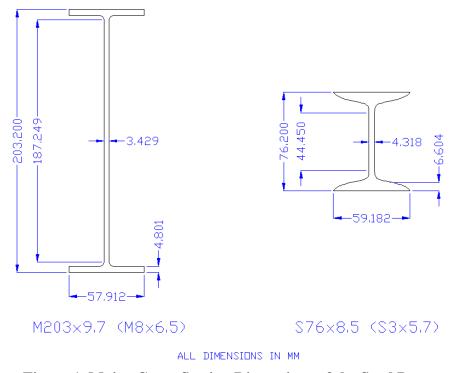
Major Cross-Section Dimensions of the Steel Posts
